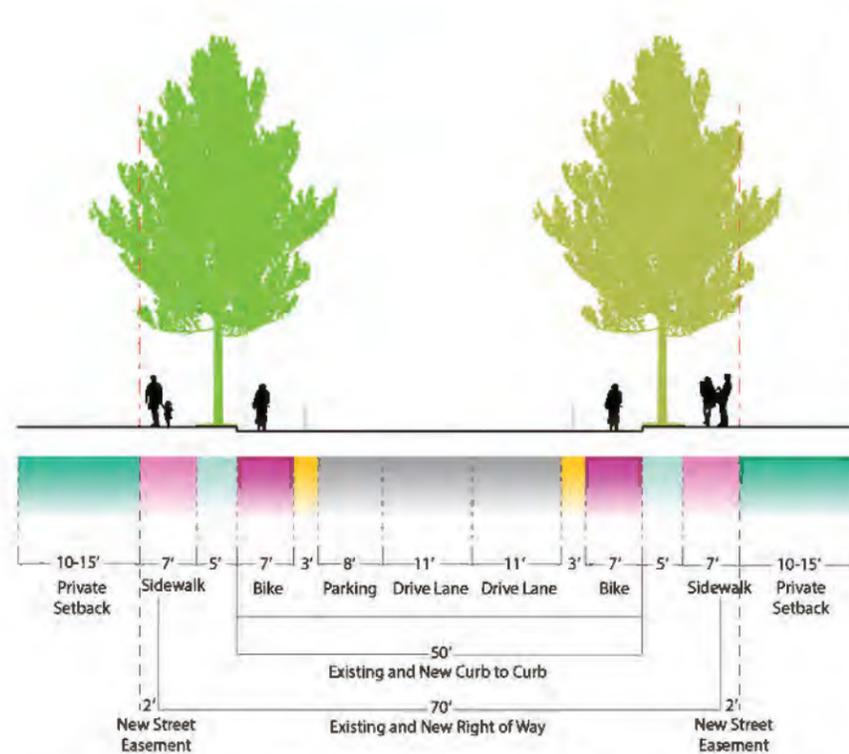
Typical section — Logue, Maude, and Clyde Avenues
